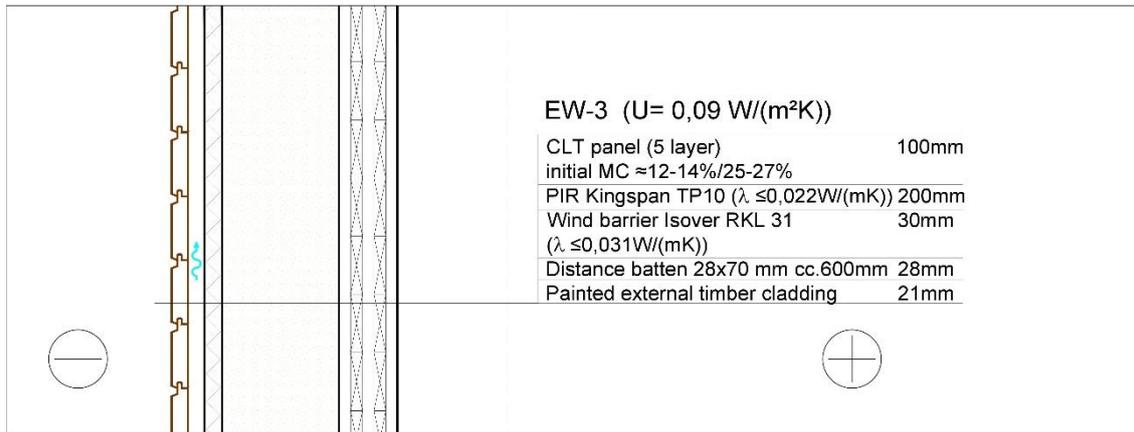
Section of the wall type EW-3 where CLT panel is exposed to internal room temperature and PIR kingspan as insulation material (Technical drawing by Villu Kukk adjusted by the author).
